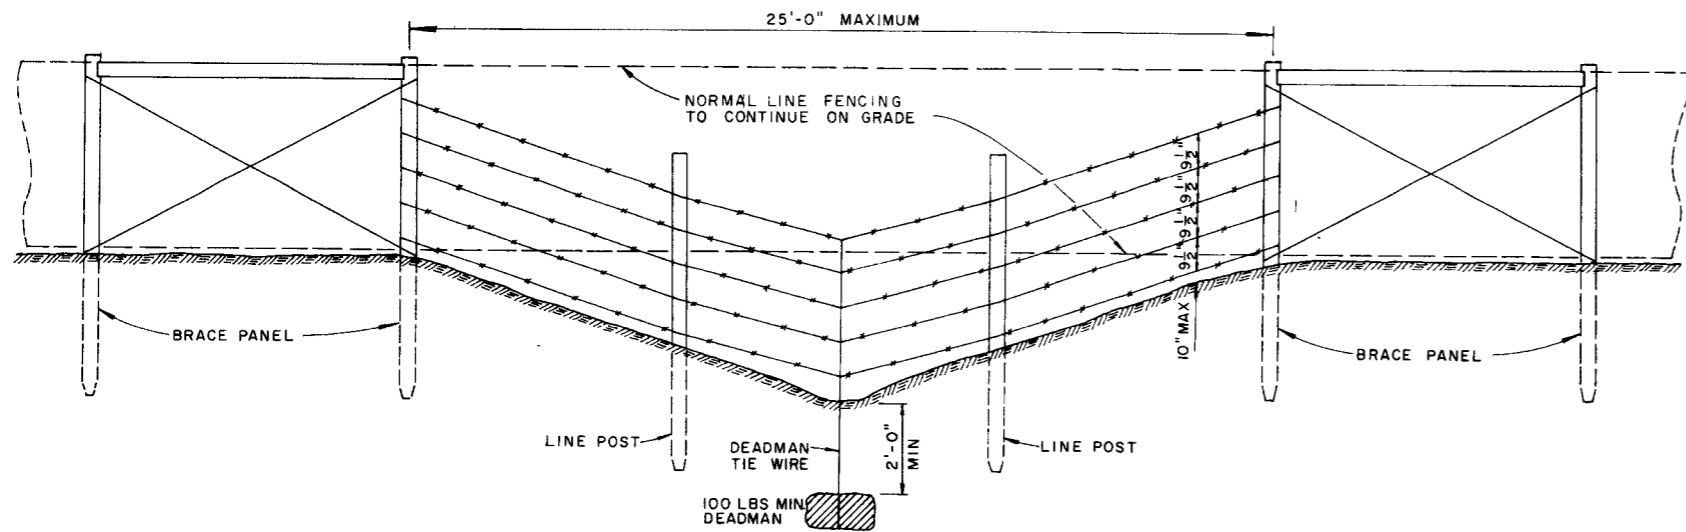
DETAIL OF FENCE CONSTRUCTION AT LARGE CULVERTS (5' IN HEIGHT AND OVER)
